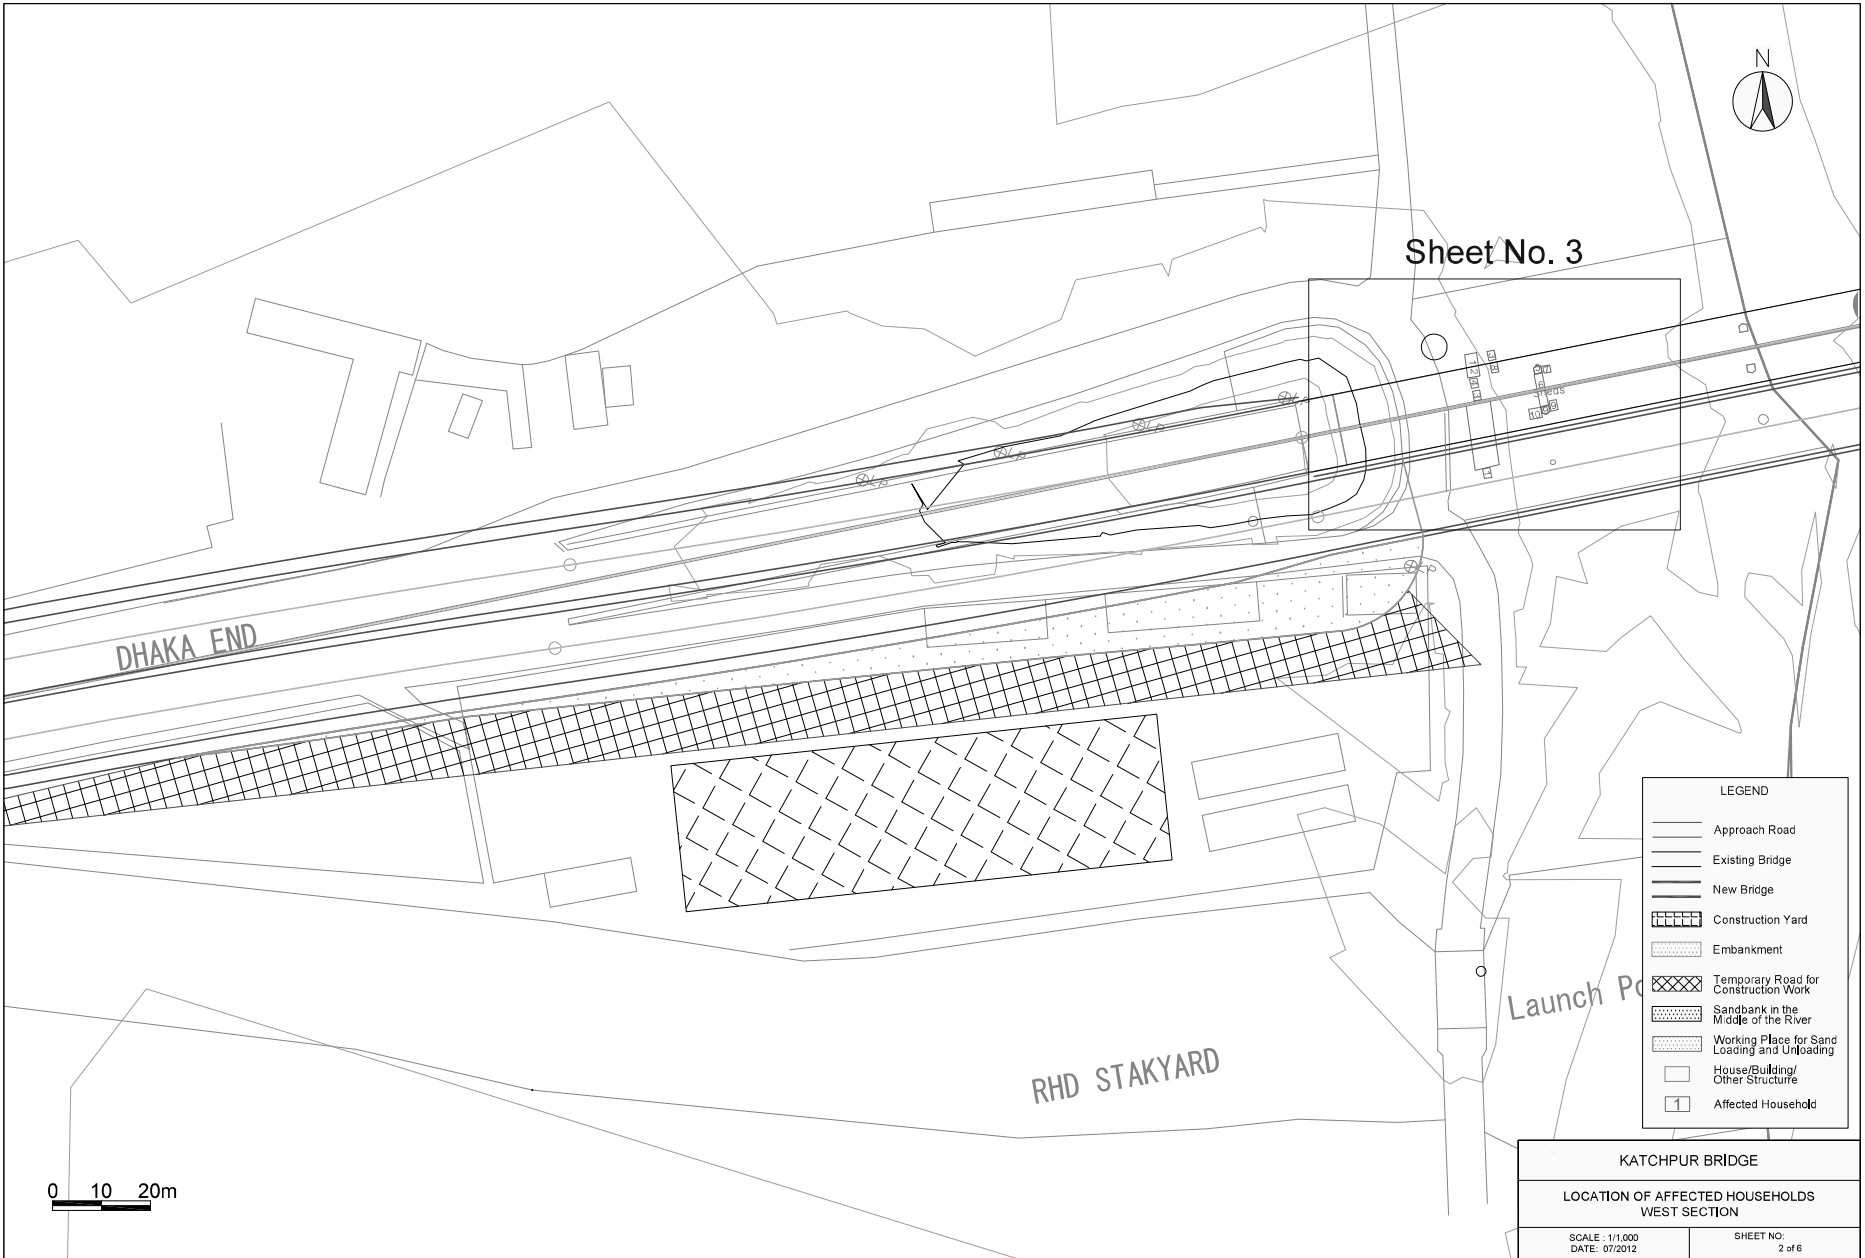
Location of Affected Households West Section (Sheet No.2)
